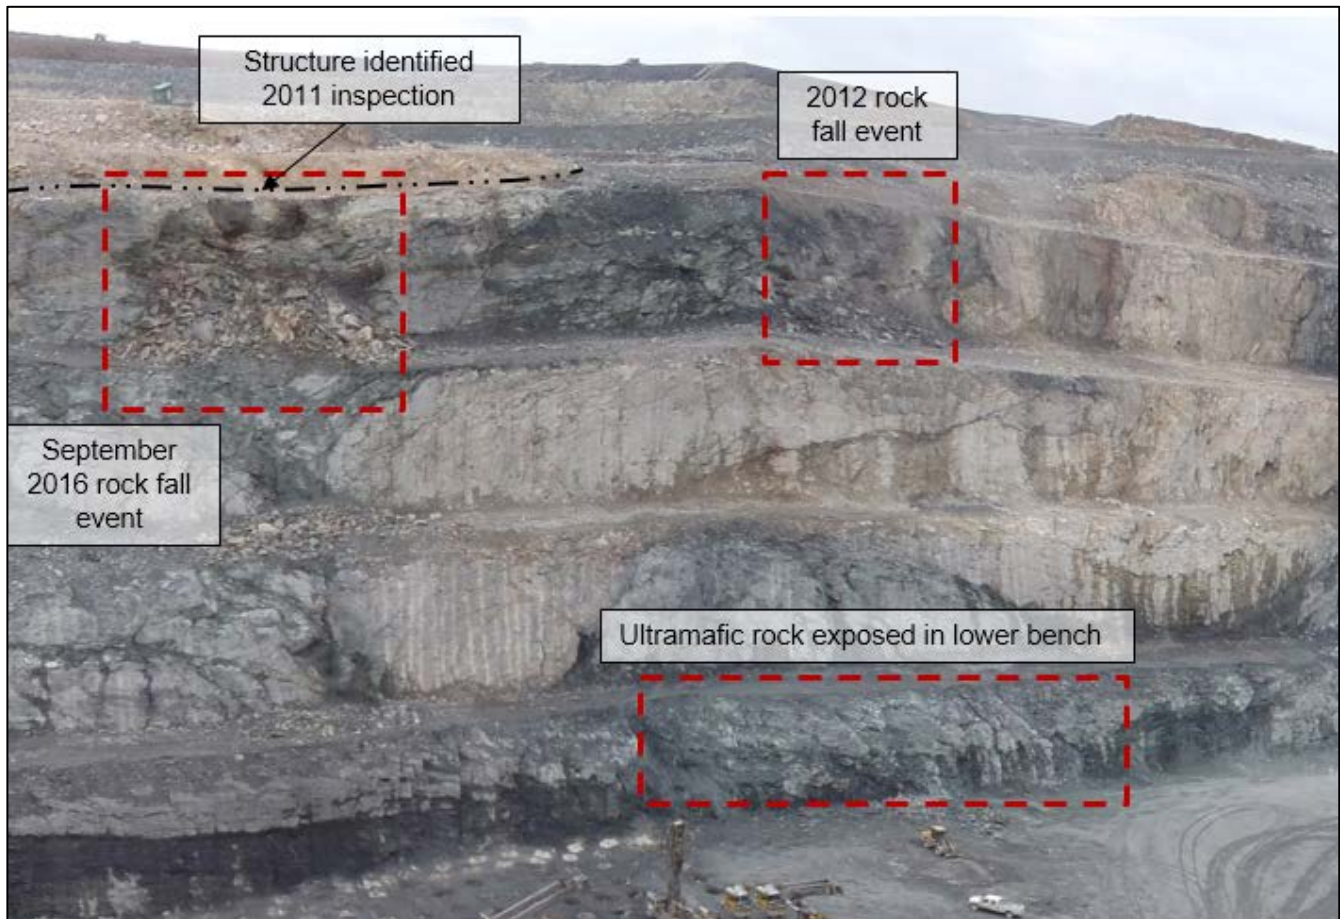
Ultramafic rock exposed at toe of Pit A west wall
